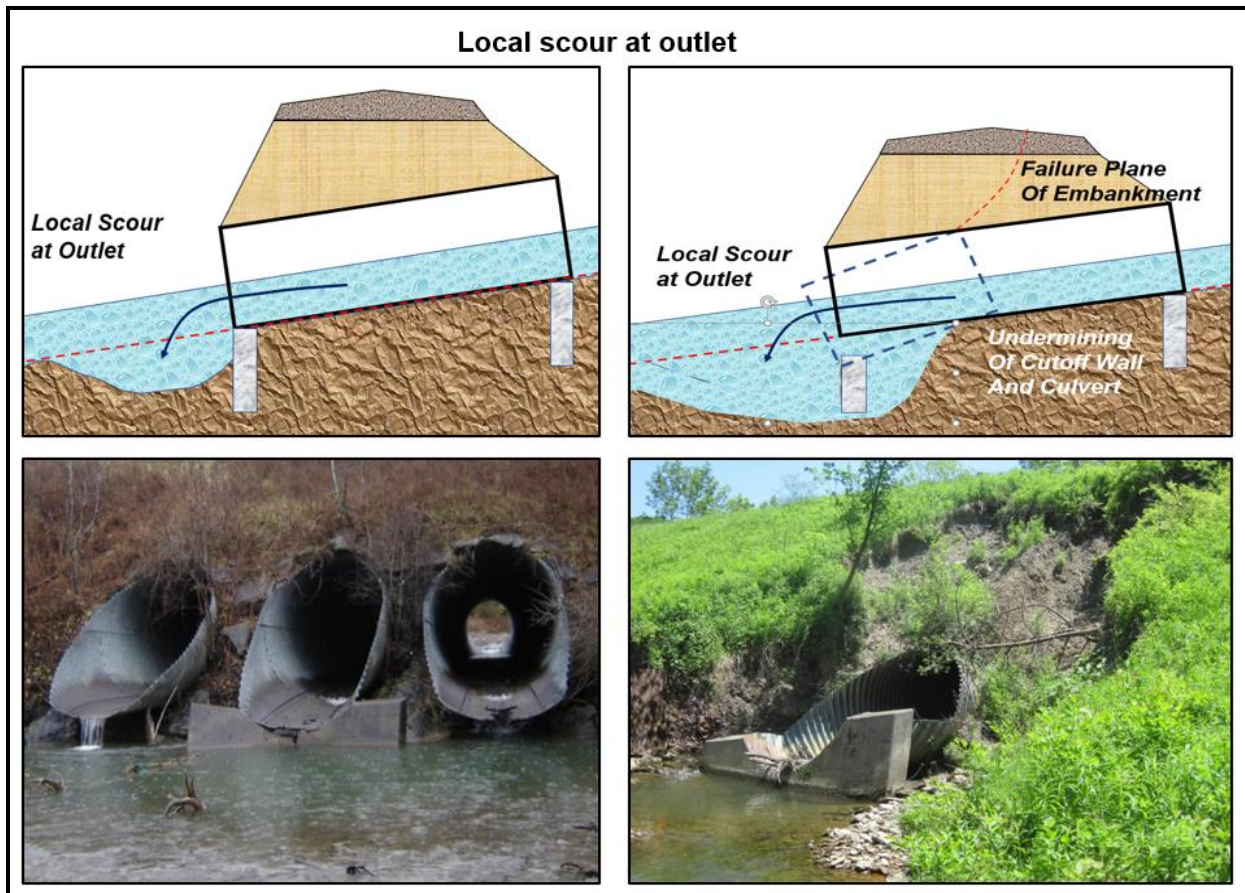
Illustration of Scour at Outlet - Rigid and Flexible Structures
